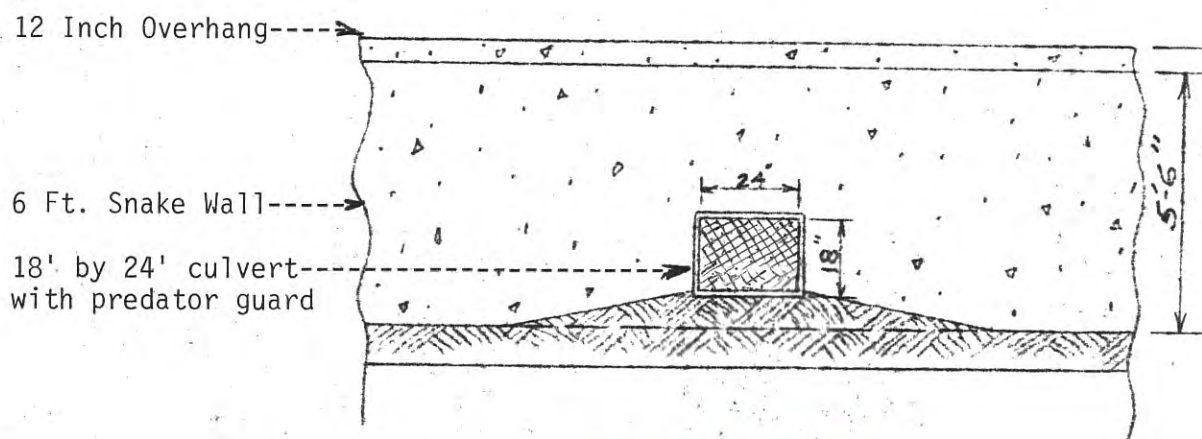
Proposed Mule Road Extension with Snake Tunnel under pavement.
